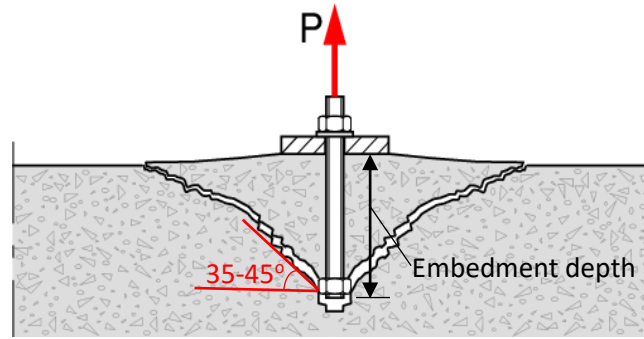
Concrete cone breakout failure subjected to tension load (Nilsson et al. 2011).
